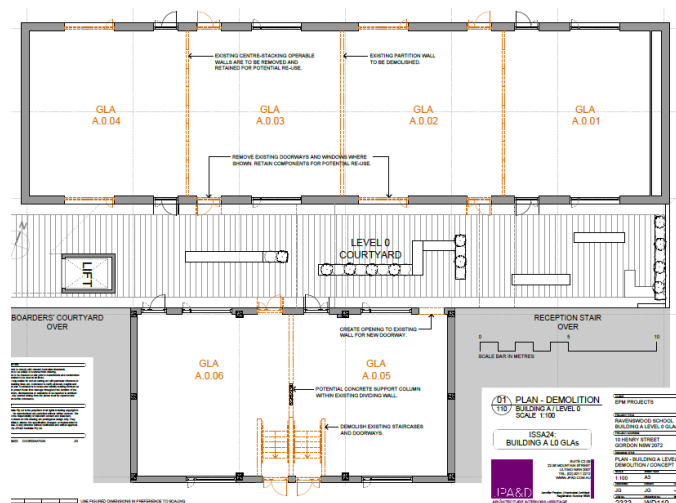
Demolition plan - Building A Ground level (source: JPA&D)
